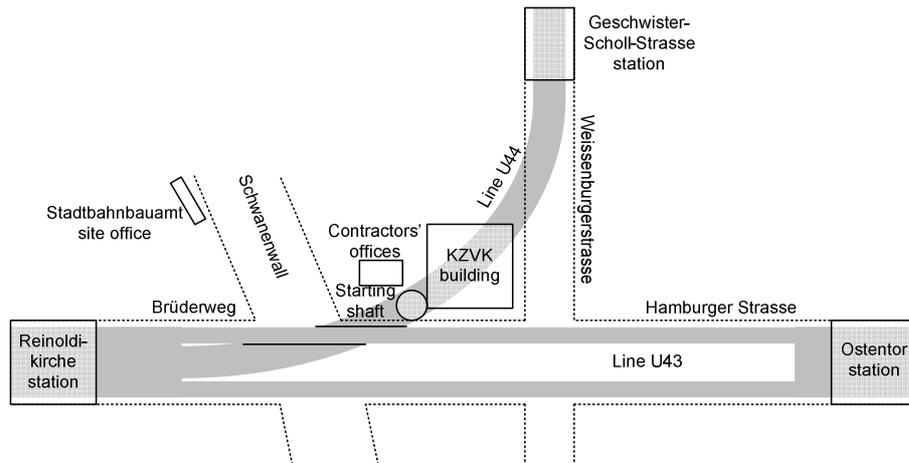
Schematic overview of construction site S10 with the U44 tunnel passing under one of the U43 tunnels and under the Kirchlichen Zusatzversorgungskasse (KZVK) building. The boundary between construction sites S10.1 and S10.2 lies between the starting shaft and the KZVK building (own illustration).
